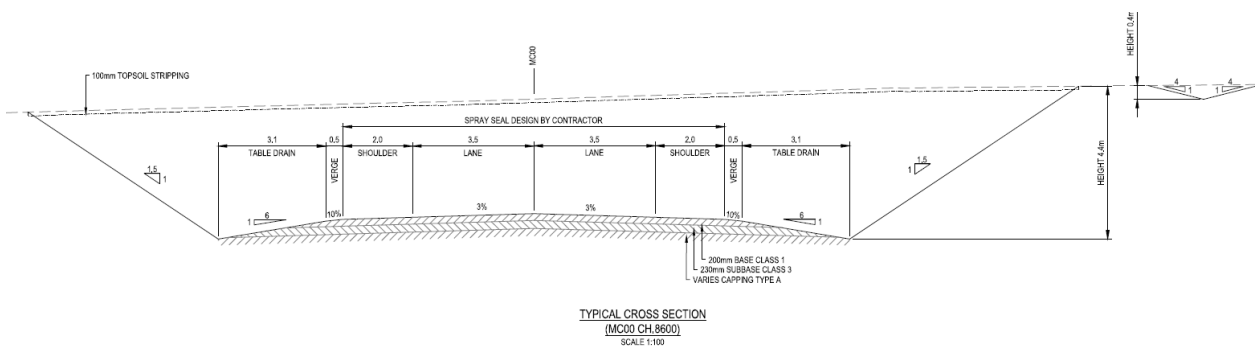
Cross section shown at CH8600 will contain the largest cut at 4.4 m. (Source: planning application documentation)
